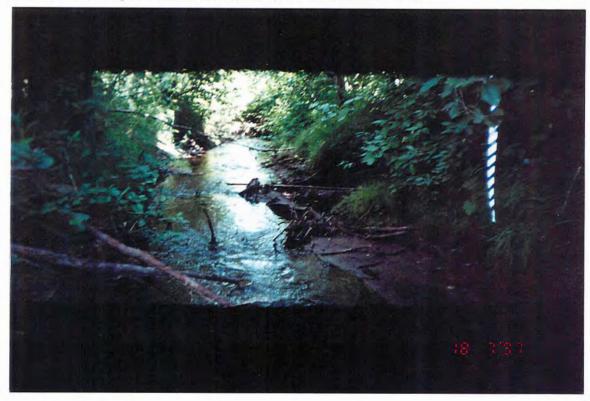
, 18-Jul-97 Site #: Z49, Looking upstream at the channel
